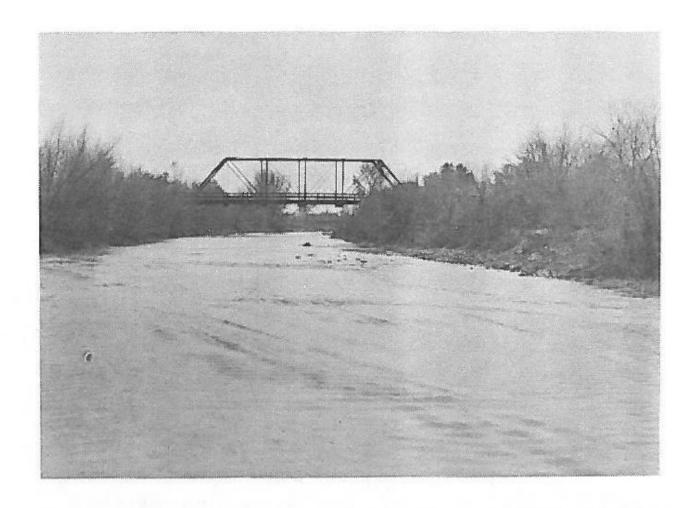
View looking upstream at Congress Street in 1902. The deep arroyo that eroded in 1890 and 1891 made river crossings more difficult. By 1902, a Pratt Truss steel bridge had been erected to span the river at Congress Street. This photograph shows a young stand of willows and cottonwoods that were probably established after the 1890 flood (Arizona Historical Society, Tucson, Negative No. 26698).
